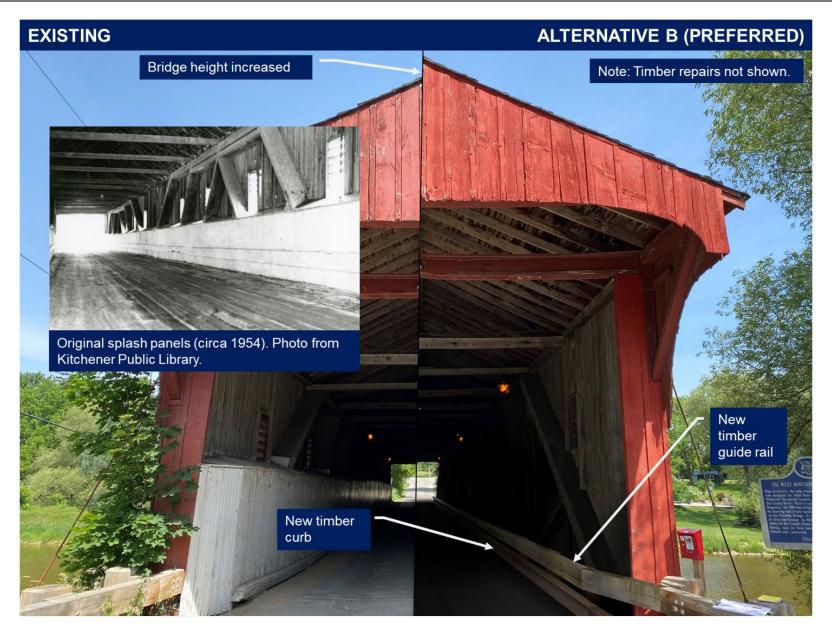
Front View – Existing and Alternative B (Timber Truss Reinforcement)
